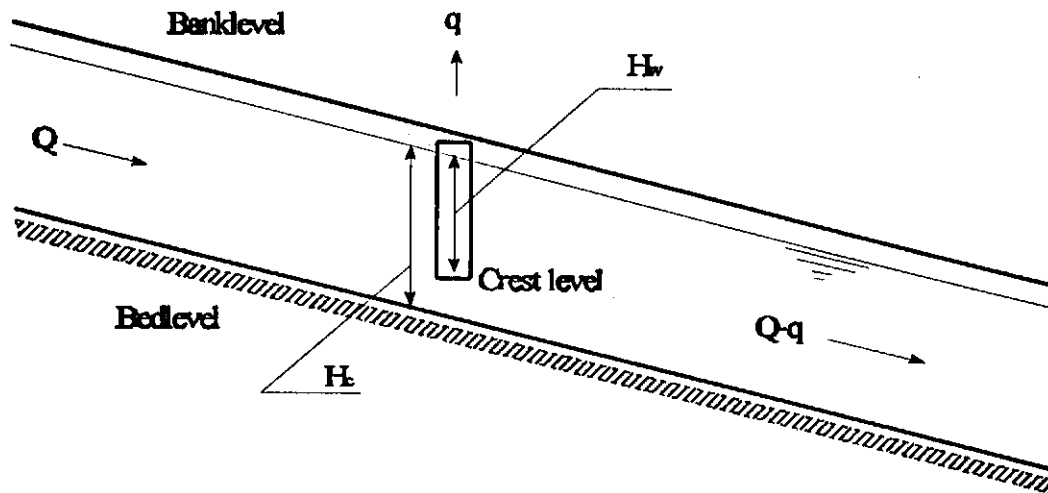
Longitudinal profile of a canal with an outlet structure.
